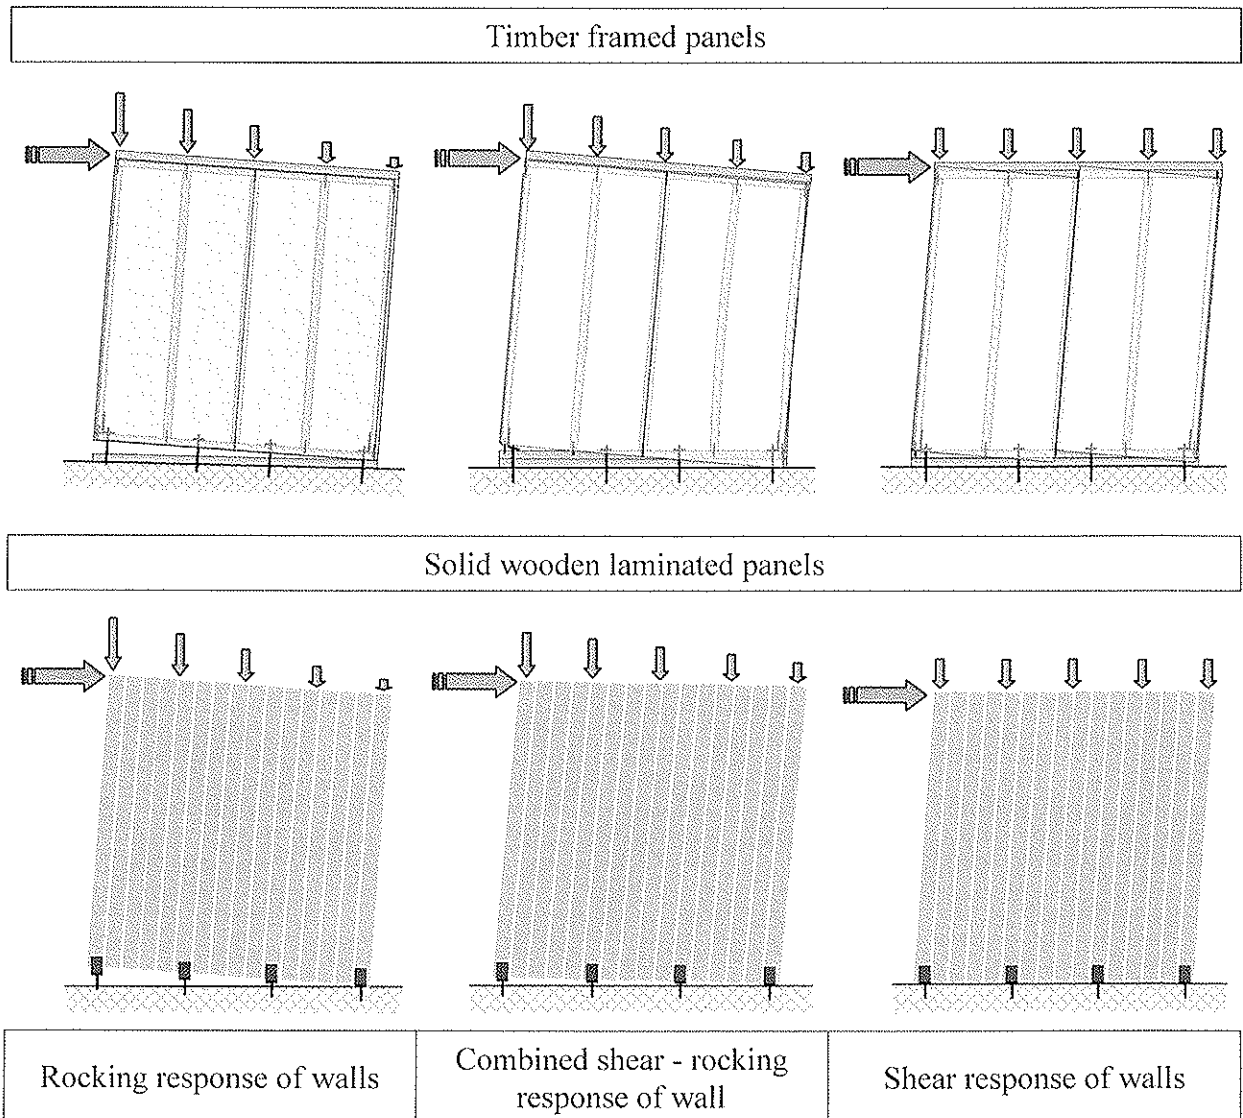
Typical responses of wooden wall panels exposed to combined vertical and horizontal load.
